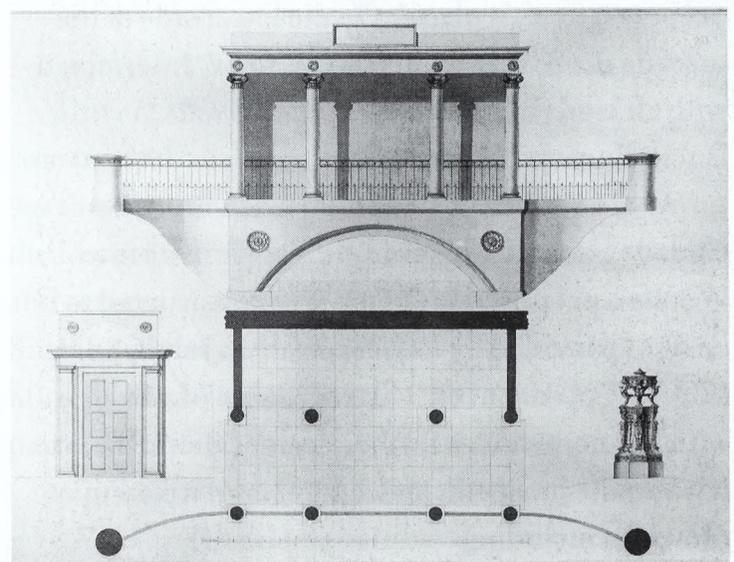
Robert Adam, Plan and elevation of the colonnade bridge as executed, tripod and doorway, 1782. *English Heritage*.
